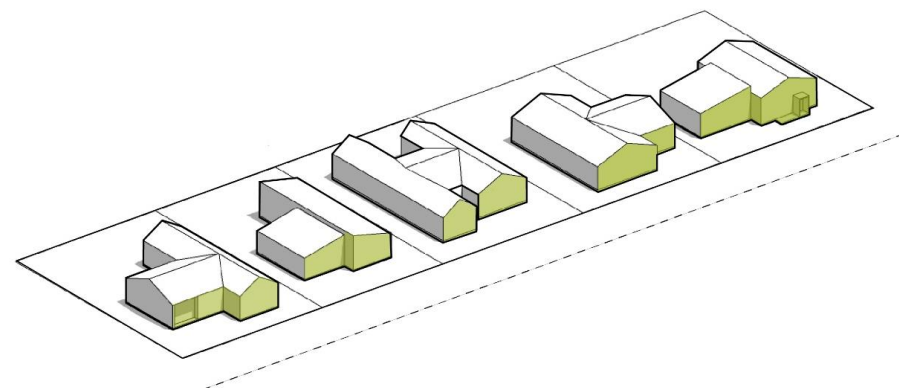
Street frontage can include a variety of building facades and design articulation to strengthen neighbourhood character.
